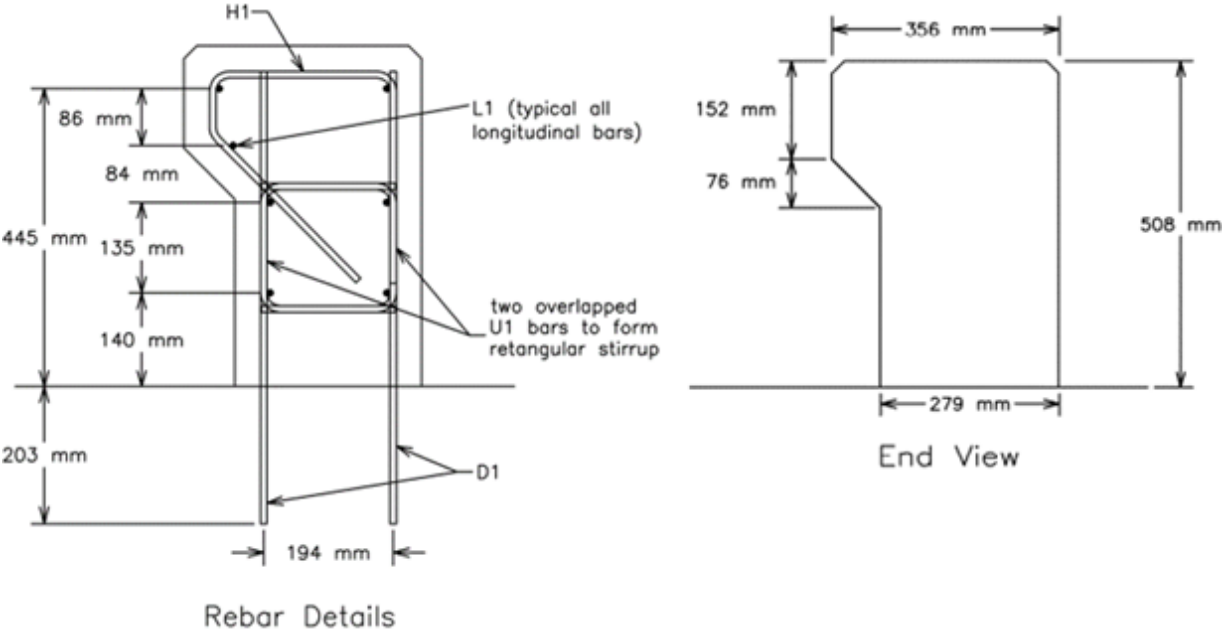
Cross Section Design Drawings of NCHRP Report No. 350 NDOT TL-2 Low-Profile, Concrete Bridge Rail System [2]
